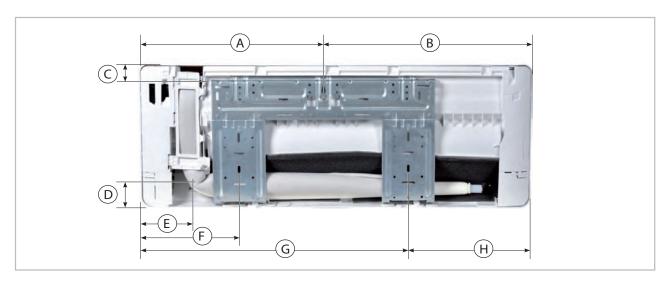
Wall bracket for indoor units ML 265 DC-685 DC IT (rear view)
